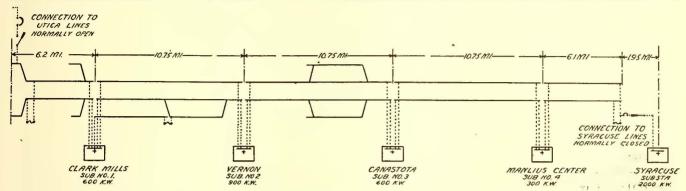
LOCATION OF SUBSTATIONS AND THIRD-RAIL LAYOUT ON THE ONEIDA LINE, NEW YORK STATE RAILWAYS
